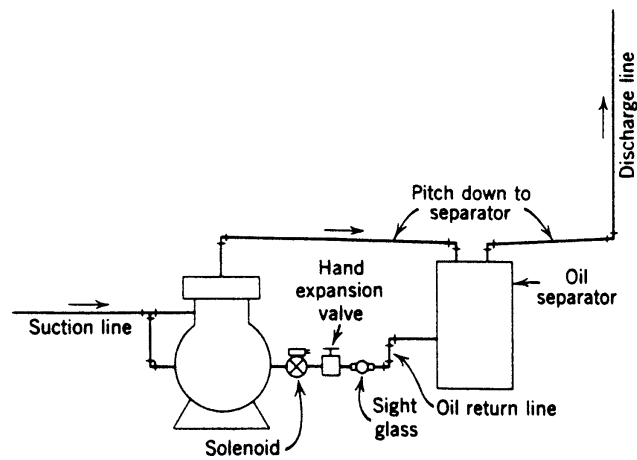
Arrangement for preventing liquid return to compressor crankcase.
